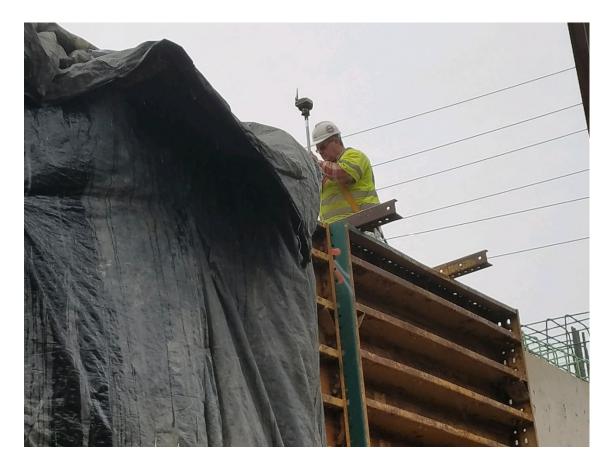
RE Pierson surveyor checked bearing grades at tops of North and South Abutment Walls
